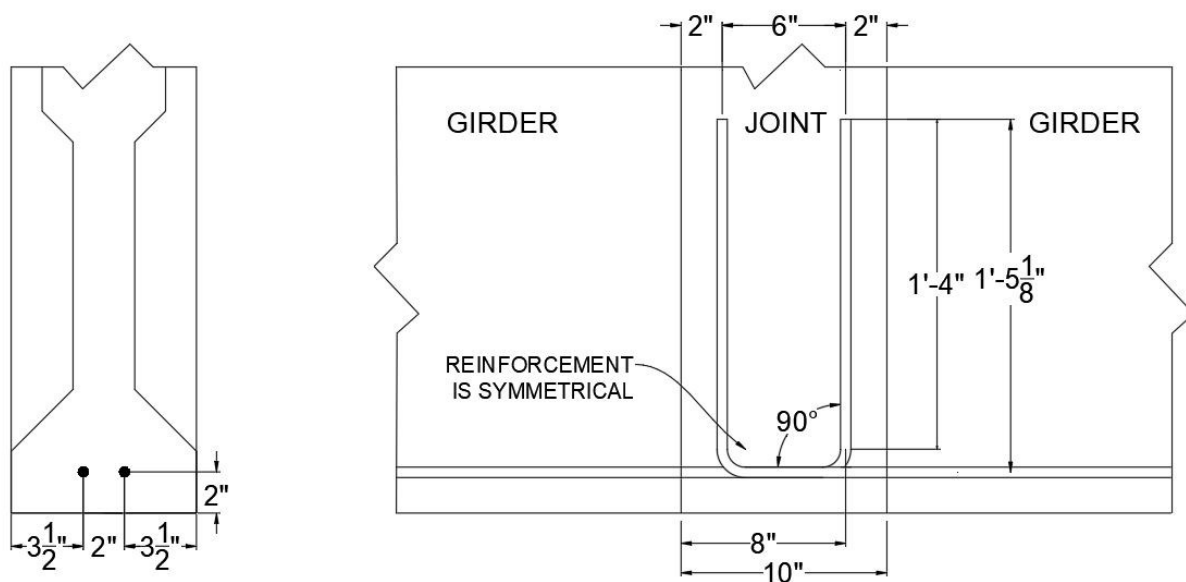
Newly constructed continuity joint prestressing strands detail for positive moment.
